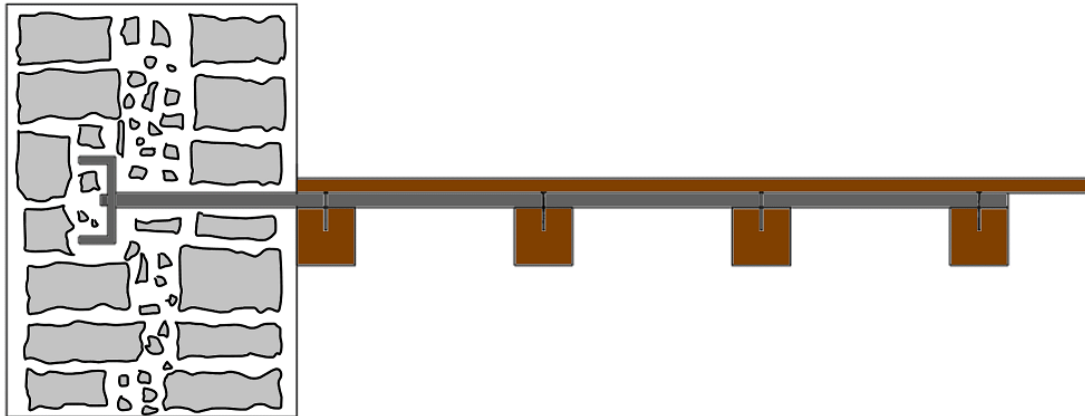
Reinforced timber floors using the anchoring system of Pombalino buildings.
